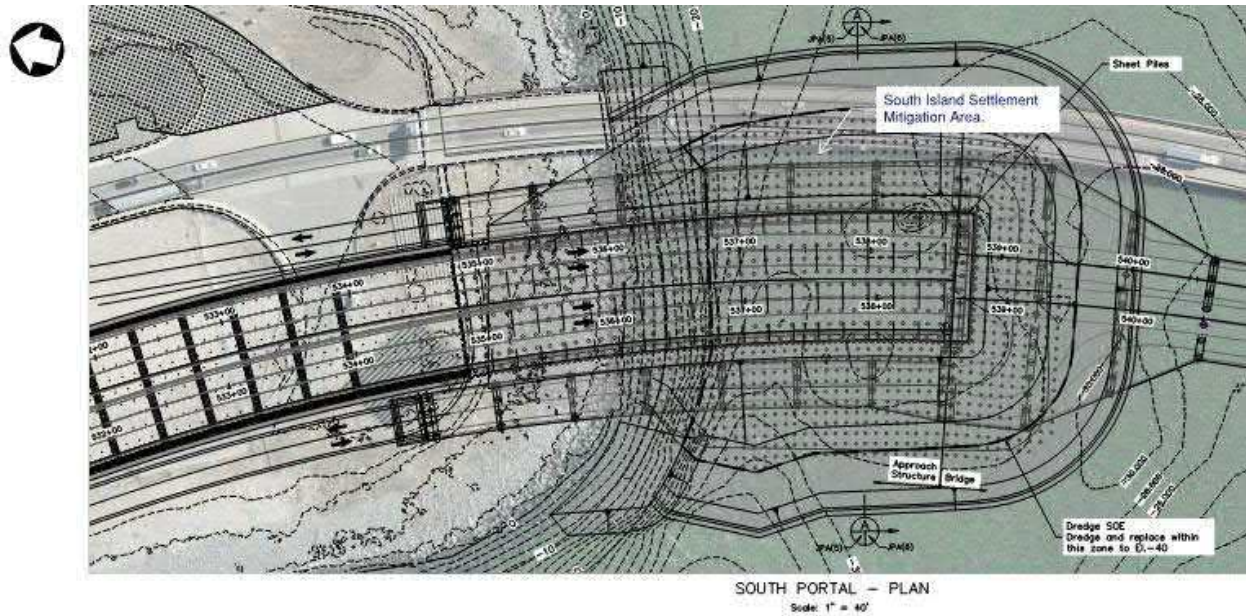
South Island Expansion Proposed Sheet Pile Wall and Piles
